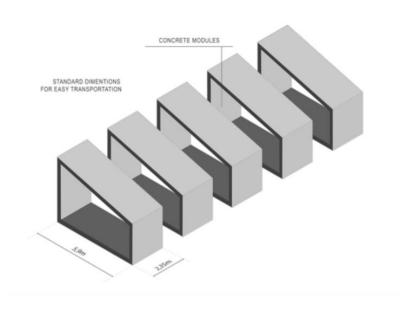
SUMMARY architecture studio's take on precast concrete modular construction (SUMMARY, 2022)
